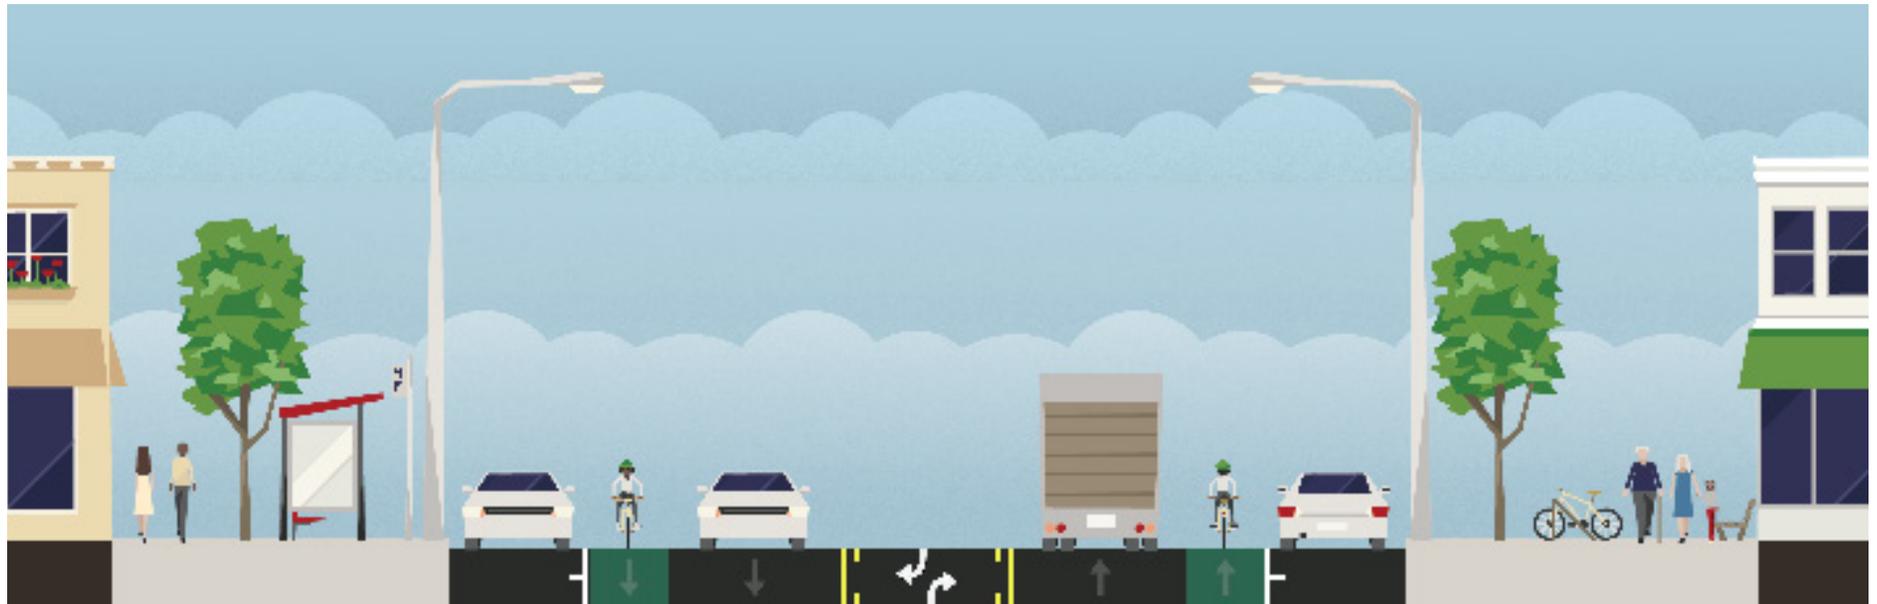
Cross-section of a Street Built to Accommodate All Users (Project B1)
